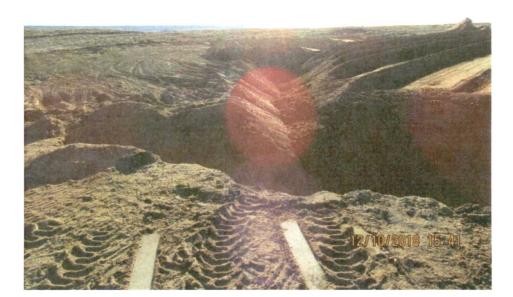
Final North excavation area. Photo taken by DJR Operating on December 10, 2018.
